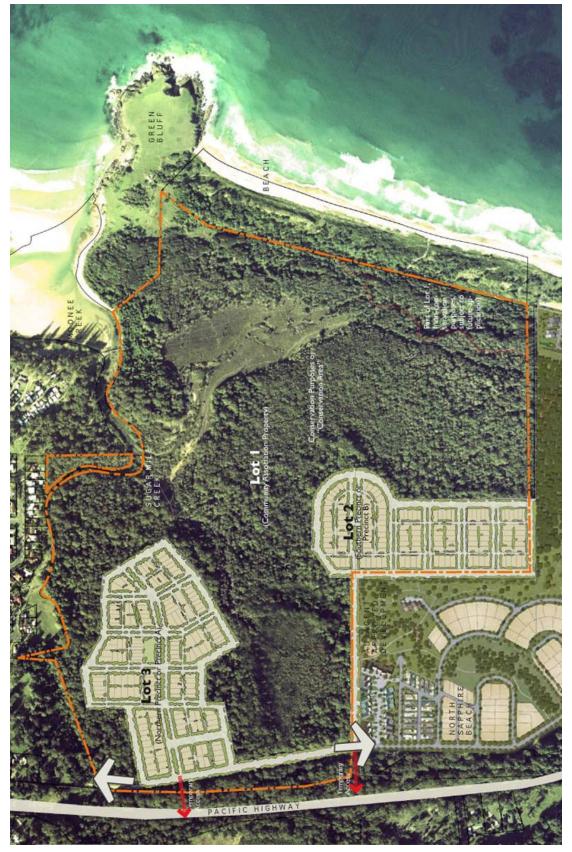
Moonee Waters Concept Plan proposed site layout [*Source:* Annard Alcock Urban Design]
